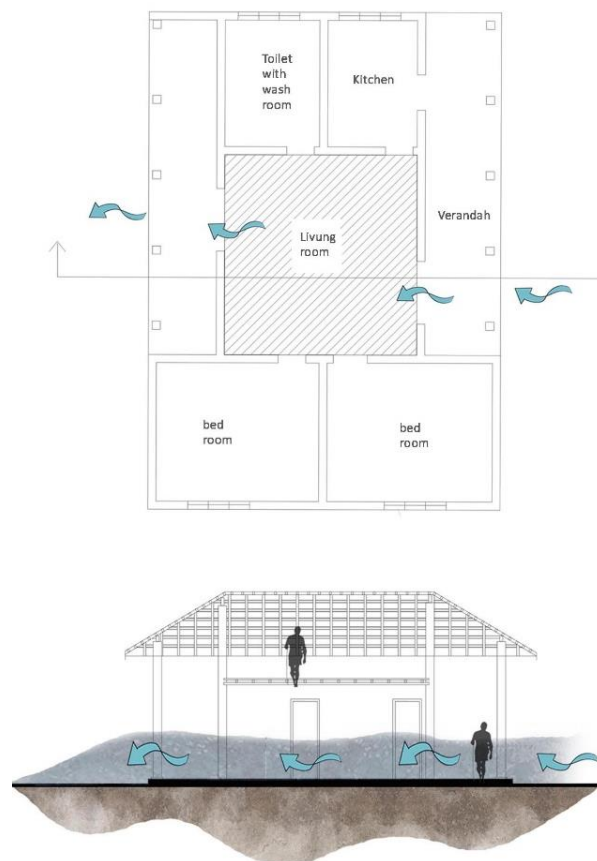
Floor Plan and Cross Section showing movement of flood water and level of inundation in Case 7 (Source: Henarangoda, 2020)
